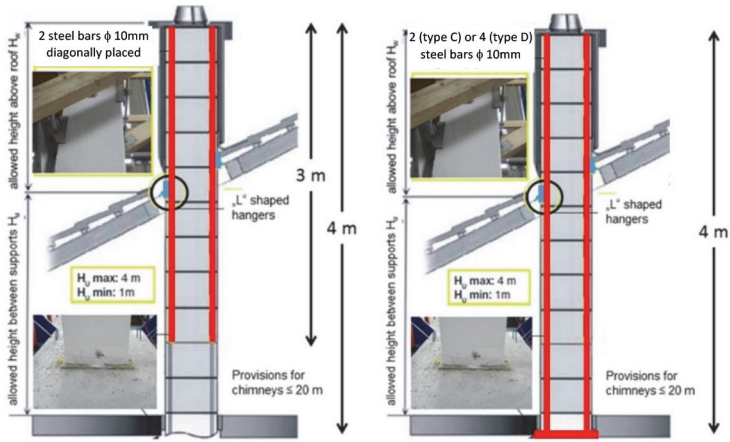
Boundary conditions of test setup, vertical section with longitudinal reinforcement bars through the type A and B chimney systems (left) and for type C and D chimney system (right)
